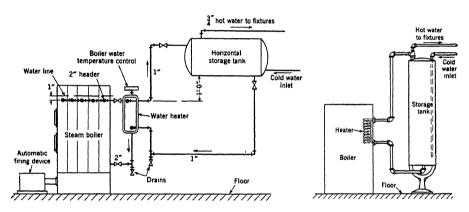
Indirect Water Heater Mounted on Side of Boiler
